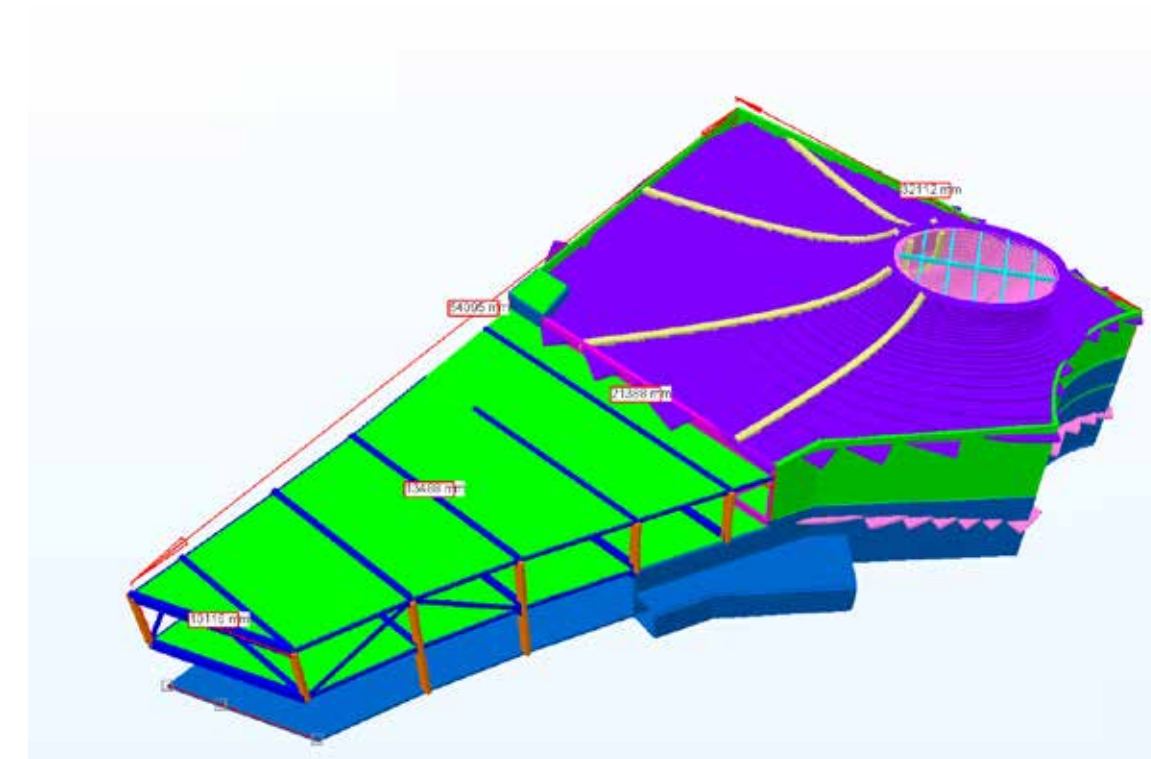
Typical detail of structural model of stepped vault system (see next images for static explanation)
